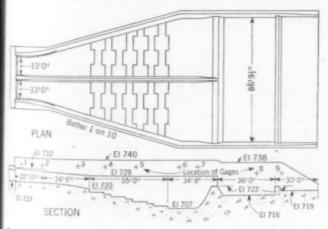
Plan and Section of Stilling Basin, Germantown Dam
